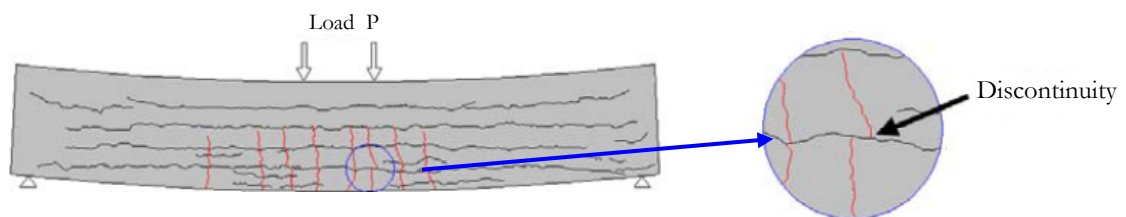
Flexural cracks in an ASR-affected beam under load
